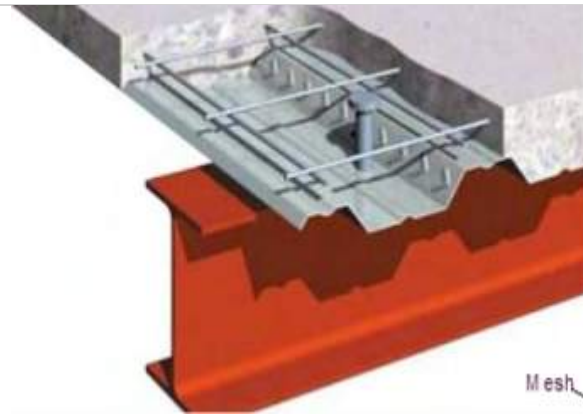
Concrete over Composite Steel Deck on Steel Beam Framing
